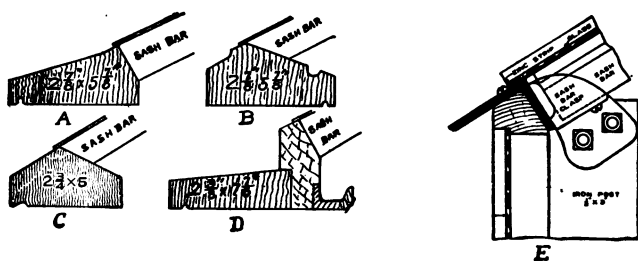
Types of eave plates. A, B, C, and D are wood; E is a metal plate
